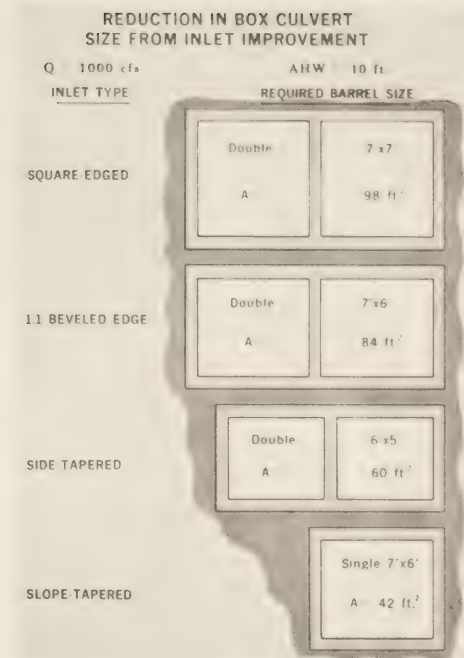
Reduction in box culvert barrel size due to inlet improvement. Flow = 1,000 cfs, allowable headwater = 10 feet, total culvert fall = 17.5 feet.
